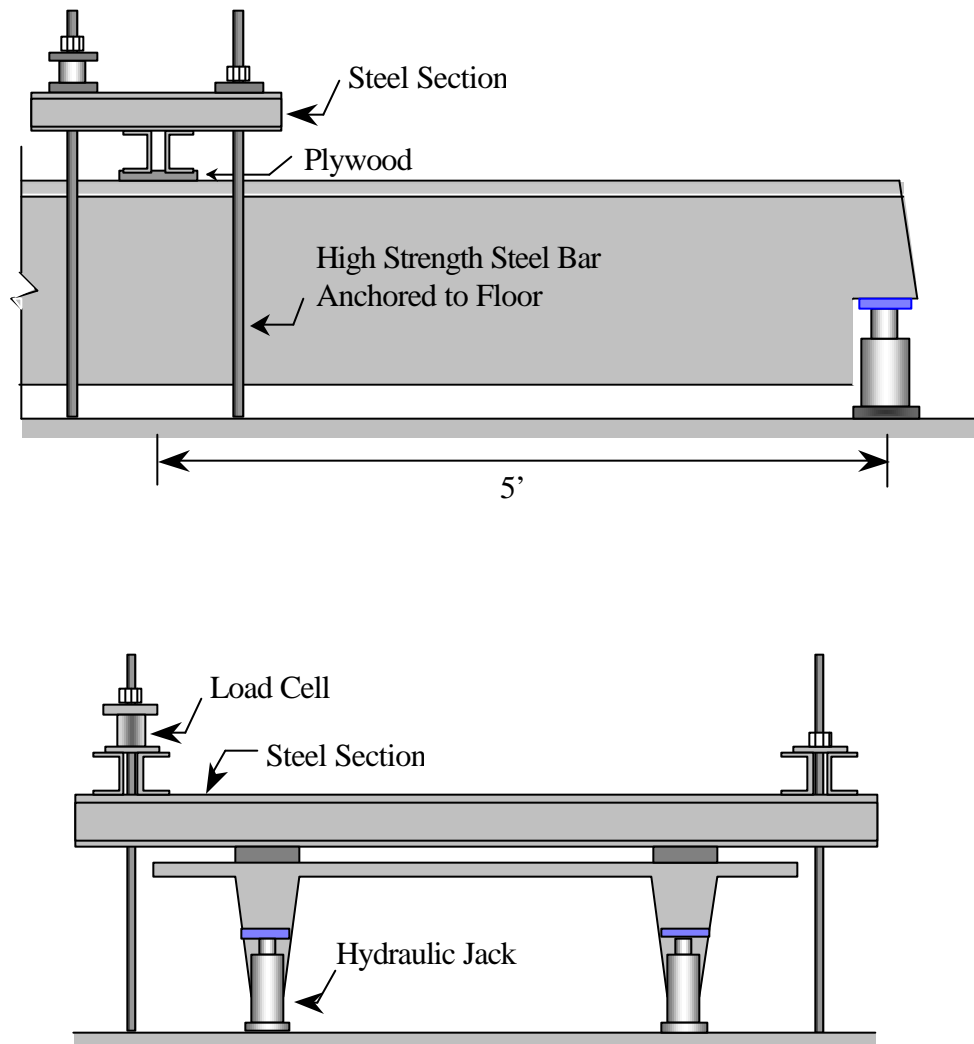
Loading Configuration of Specimens 3F-5 and 3S-5
